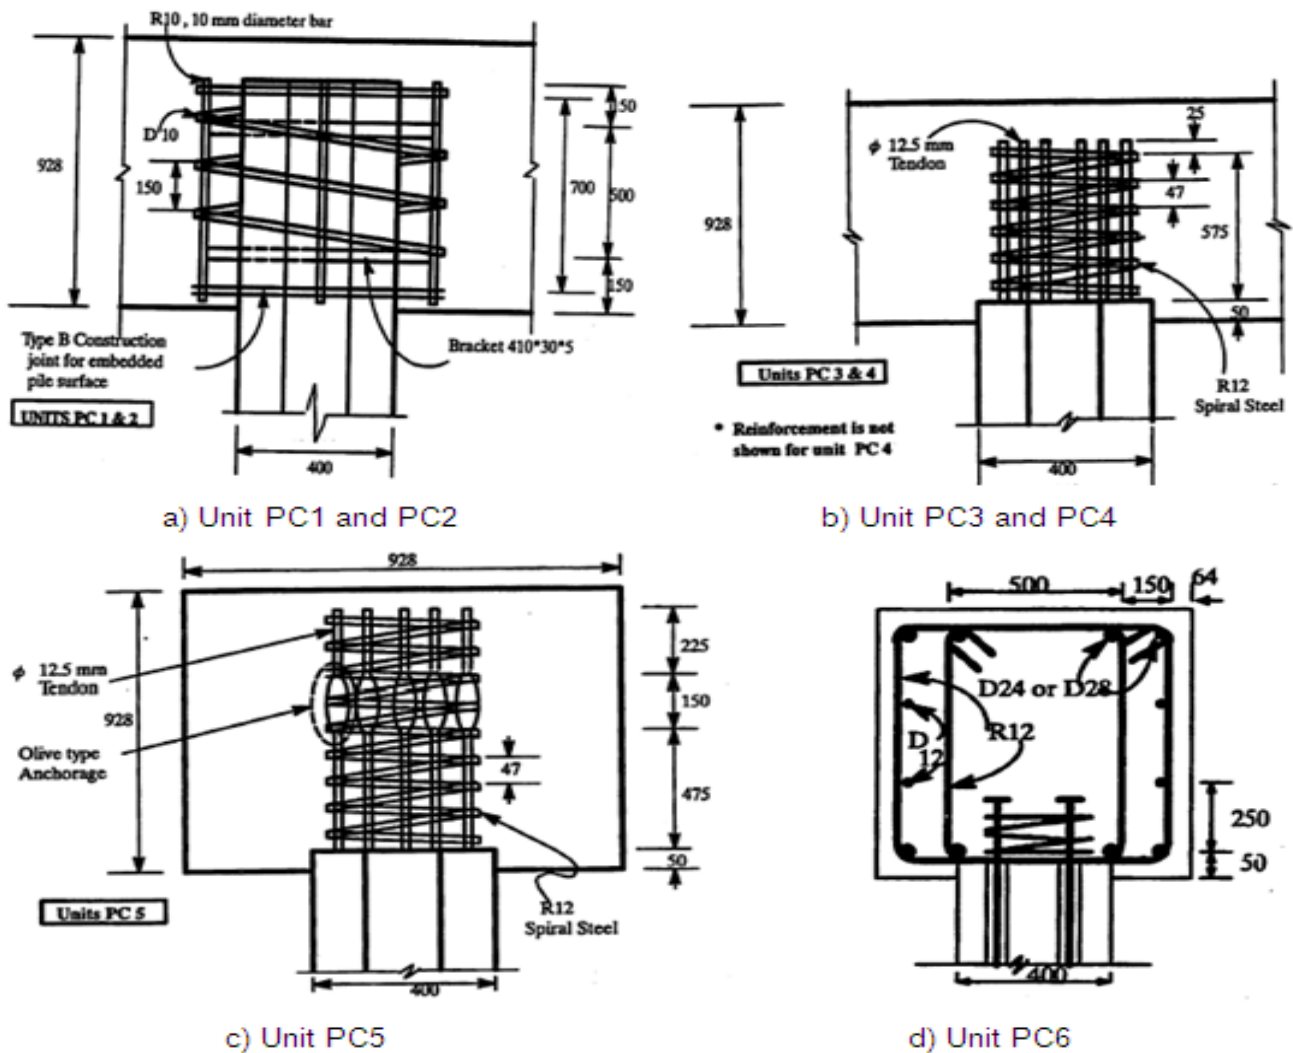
Pile-to-pile cap connection details for UC models (Pam and Park, 1990b)
